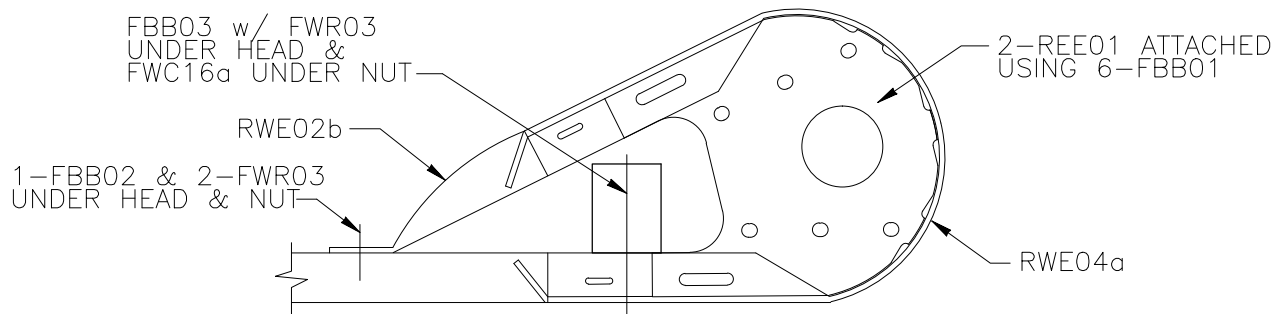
DETAIL A: BUFFERED END & ANCHORAGE ASSEMBLY
